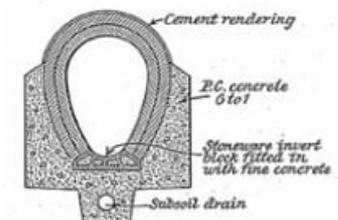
Section of Egg-shaped Sewer, showing use of Invert Block and Subsoil Drain.
